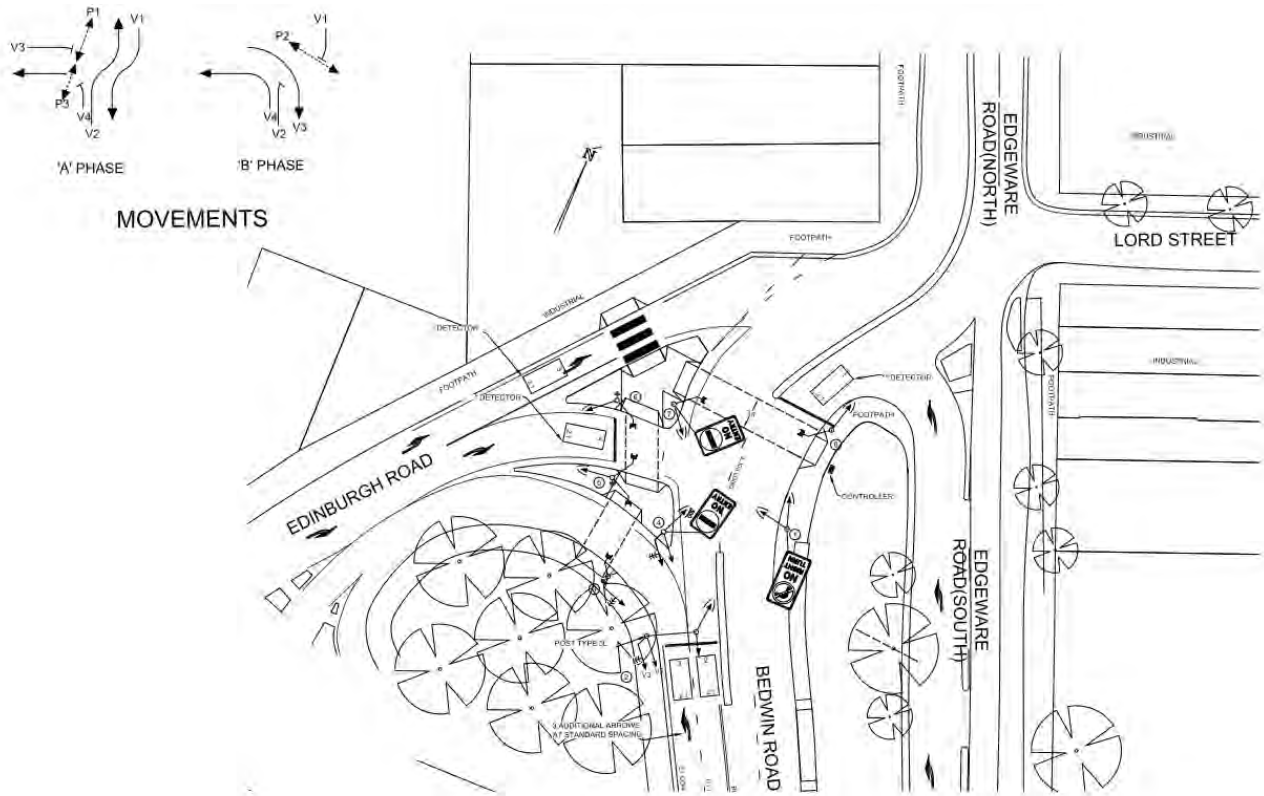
Edinburgh Road / Edgware Road proposed signals concept design
